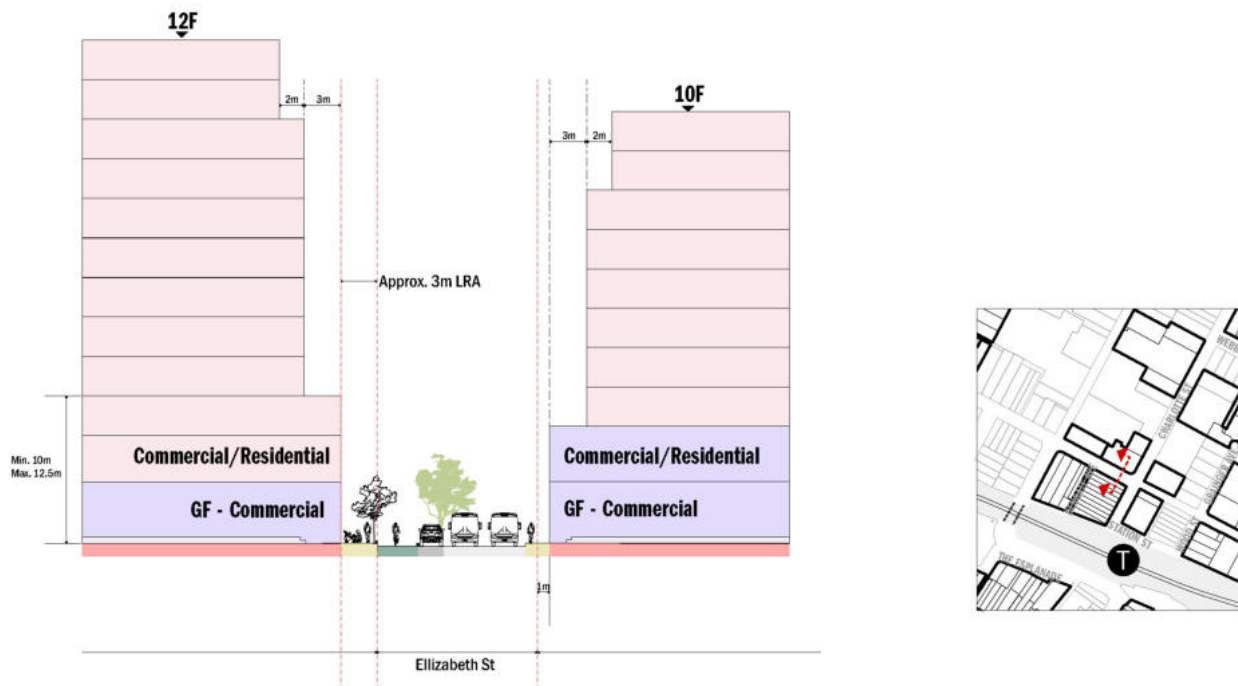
Ashfield Centre North – Elizabeth Street Section (Bland to Charlotte Street)
